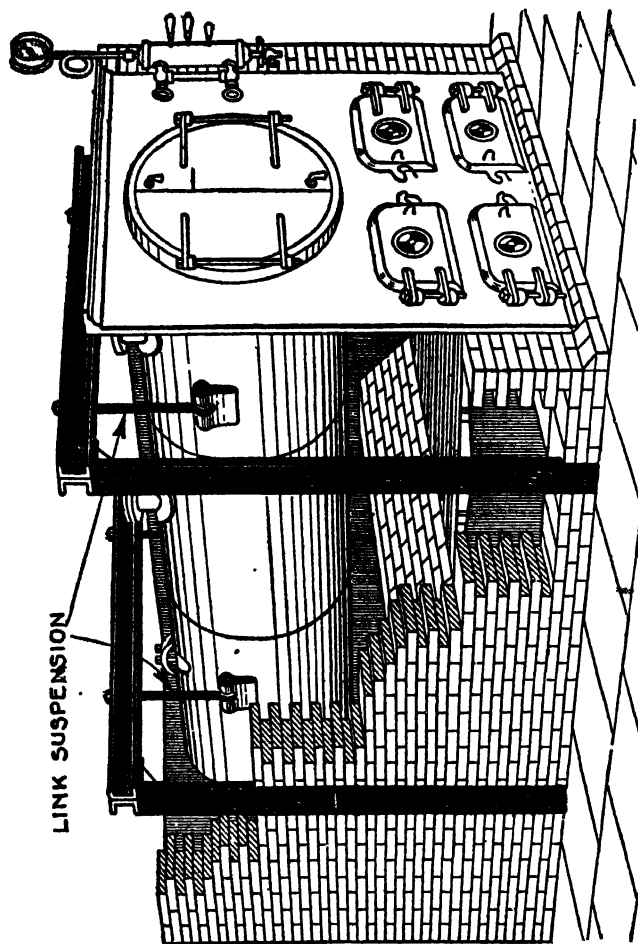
,386.—Method of providing for expansion by link suspension. As may be seen, the weight of the boiler is carried by the steel work, thus relieving the brick work of this duty. The side columns may be either of solid channel iron or built up from angles and lattice work, and channel bars are carried across the top of these columns as shown. The boiler is suspended from these channels by suspension links or rods arranged with nuts and washers, permitting easy leveling and adjustment of the height of the boiler.
